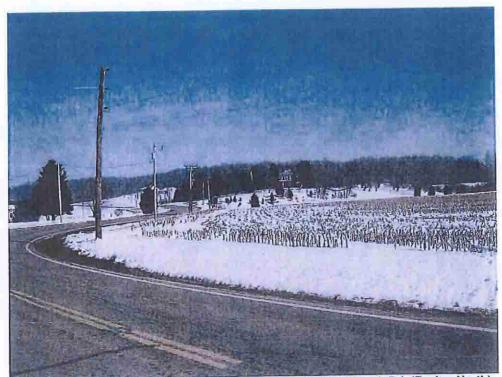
Supplement to Figure 8: Intersection S.R.56 & Pisgah Rd. (Facing North)
